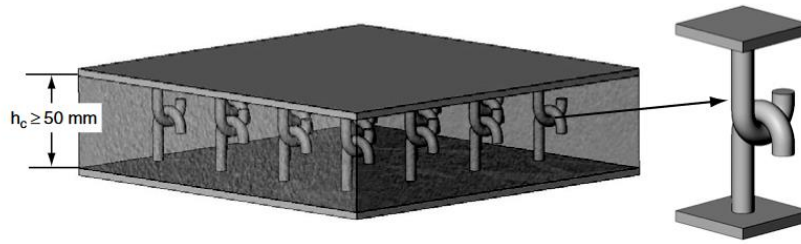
Steel-concrete-steel sandwich structure with J-hook connectors [3].
